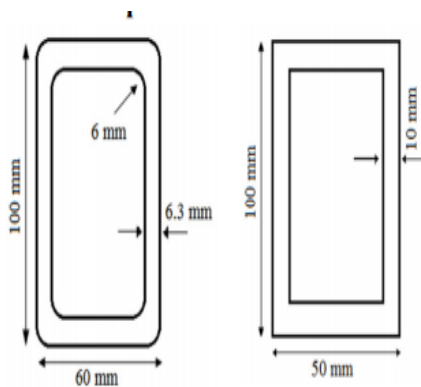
(a) Rectangular Tubular Cross section; (b) Rectangular Cross section
